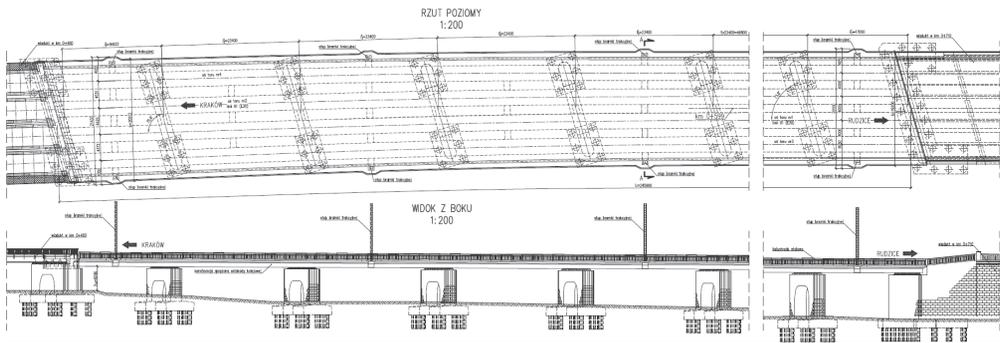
Scope of modernization of the railway line between Kraków Główny Railway Station and the Vistula River: site plan – stage III [13]
